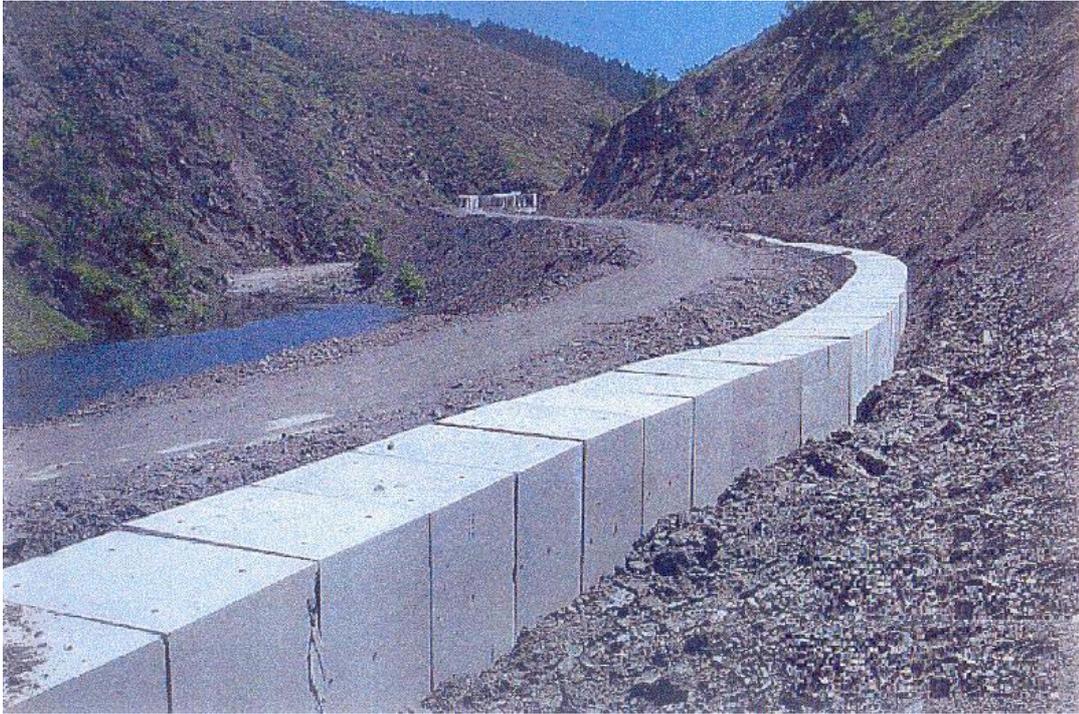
Precast, reinforced concrete culvert of Eynez-8 Panel in Karanlıkdere (Sağlamer et al., 2001)
